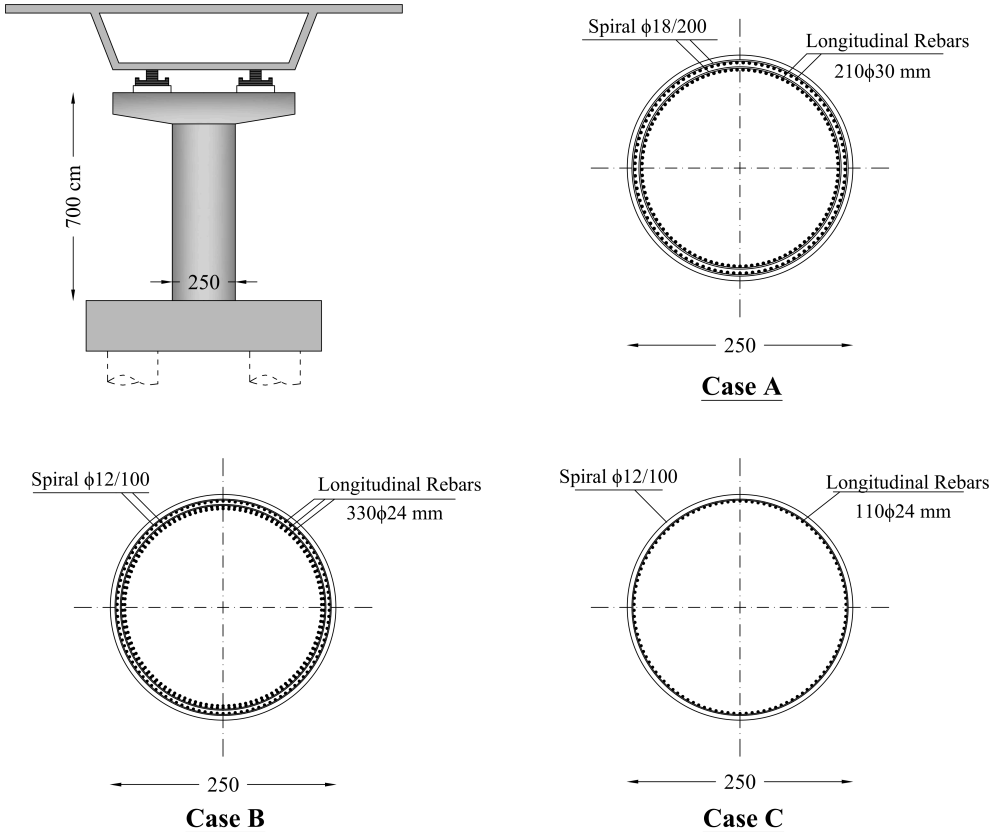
RC pier bridge geometry and reinforcements: Case A) 210 $\phi$ 30 mm longitudinal rebars and spiral  $\phi$ 30/200 mm, Case B) 330 $\phi$ 24 mm longitudinal rebars and spiral  $\phi$ 12/100 mm and Case C) 110 $\phi$ 24 mm longitudinal rebars and spiral  $\phi$ 12/100 mm.
